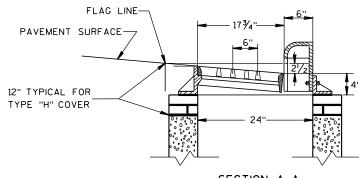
DETAIL OF CURB HEAD DEPRESSION FOR DRAINAGE AT CURB & GUTTER SECTION
